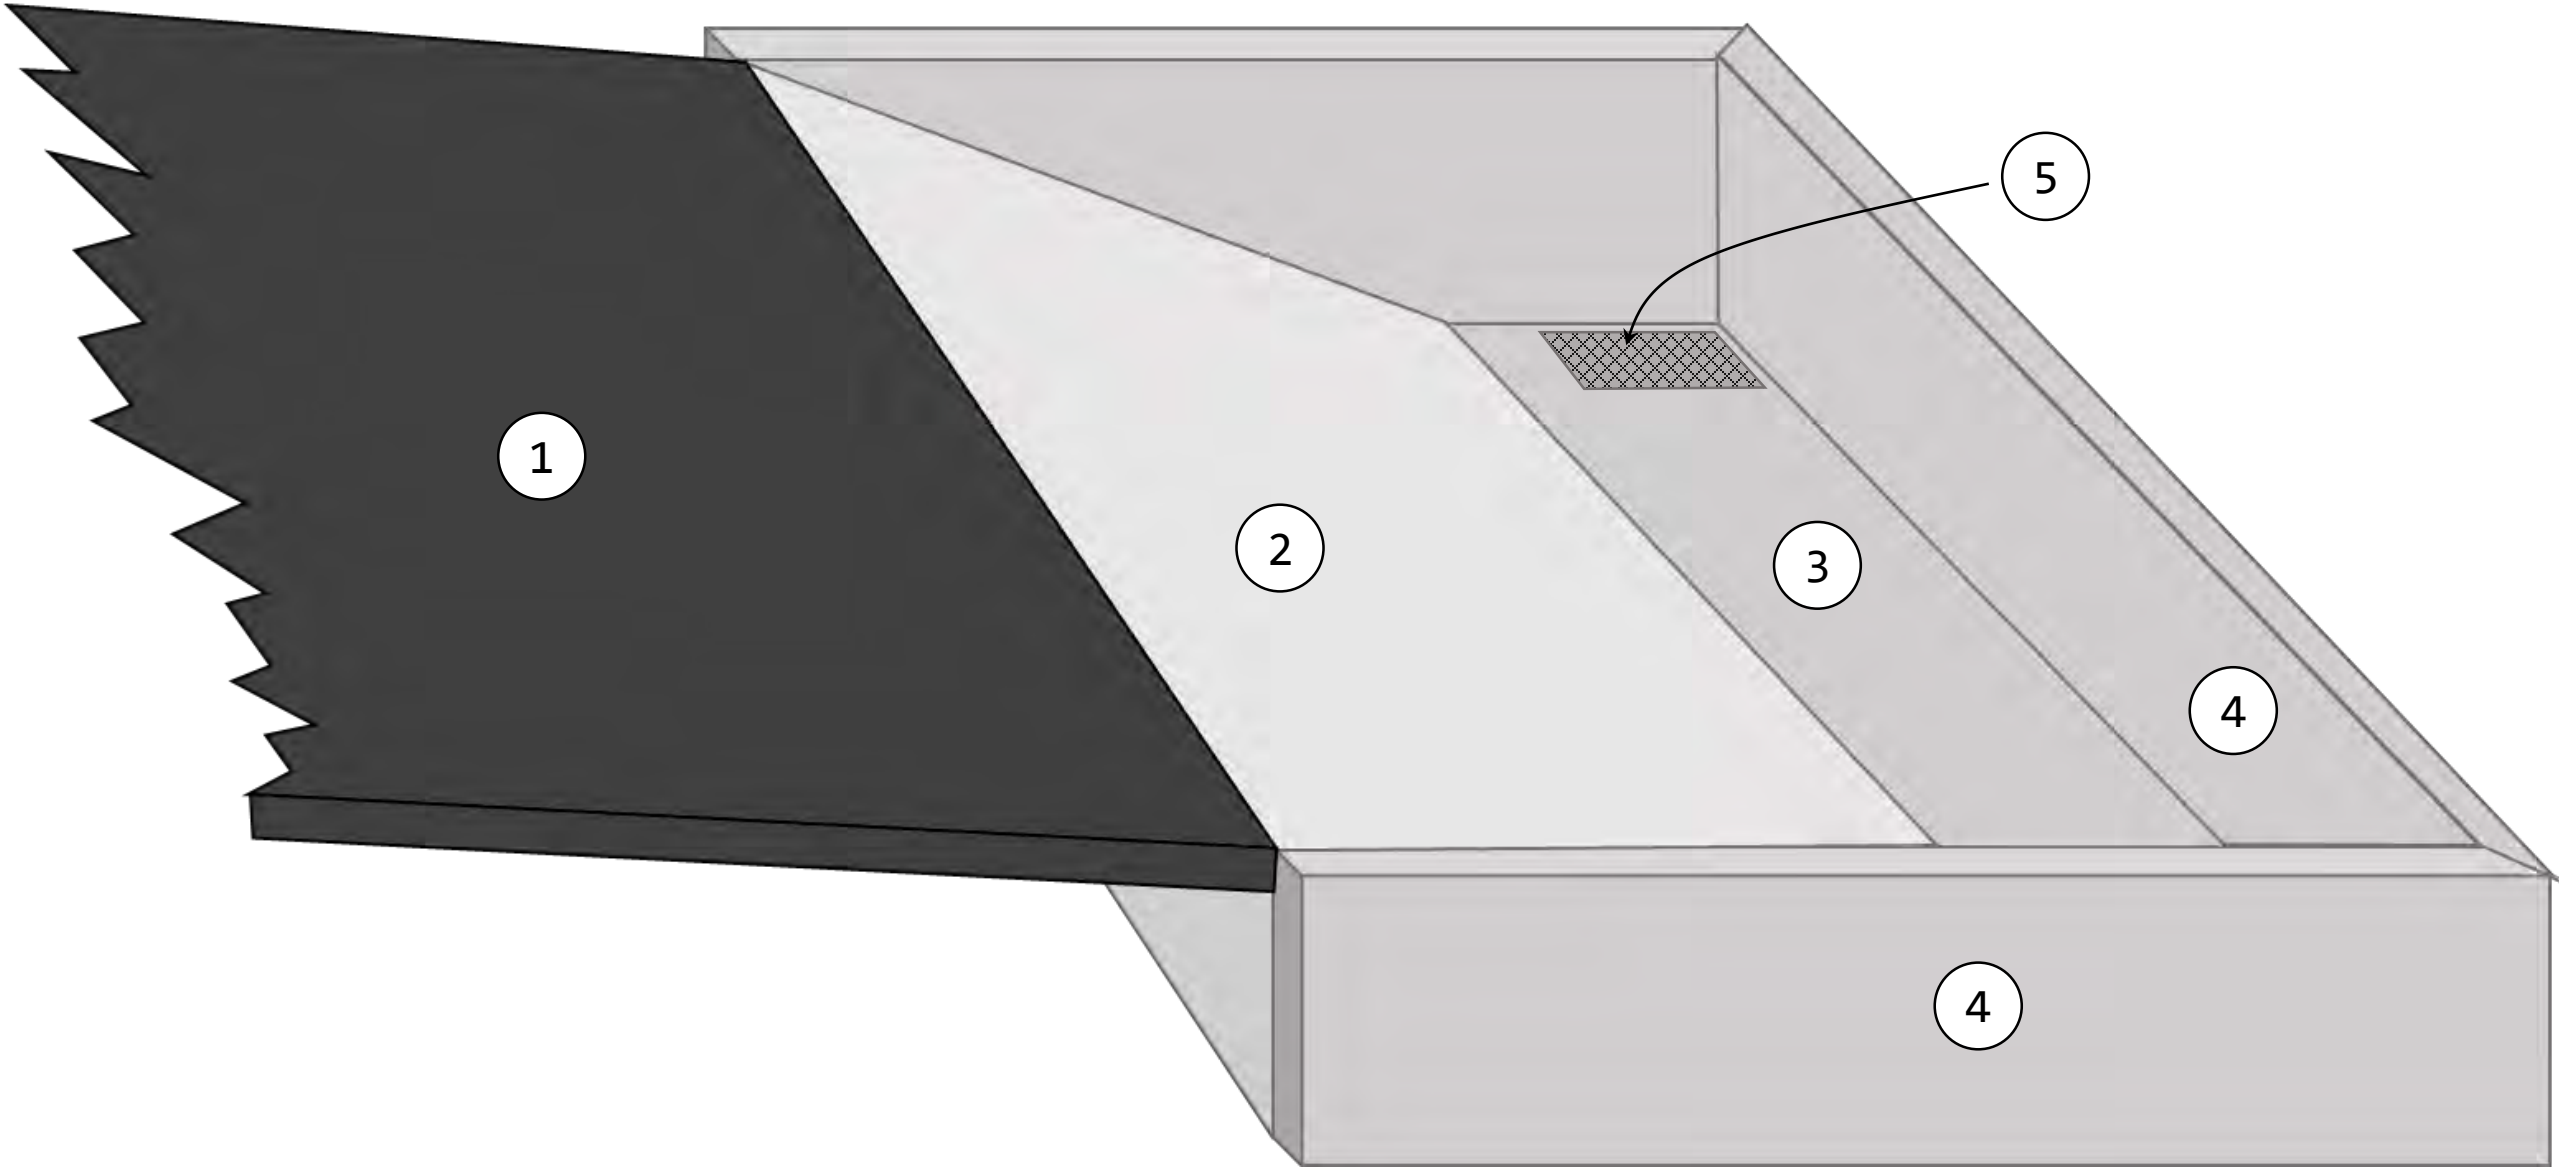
Proposed Spill, Wash Down and Stormwater Management System
